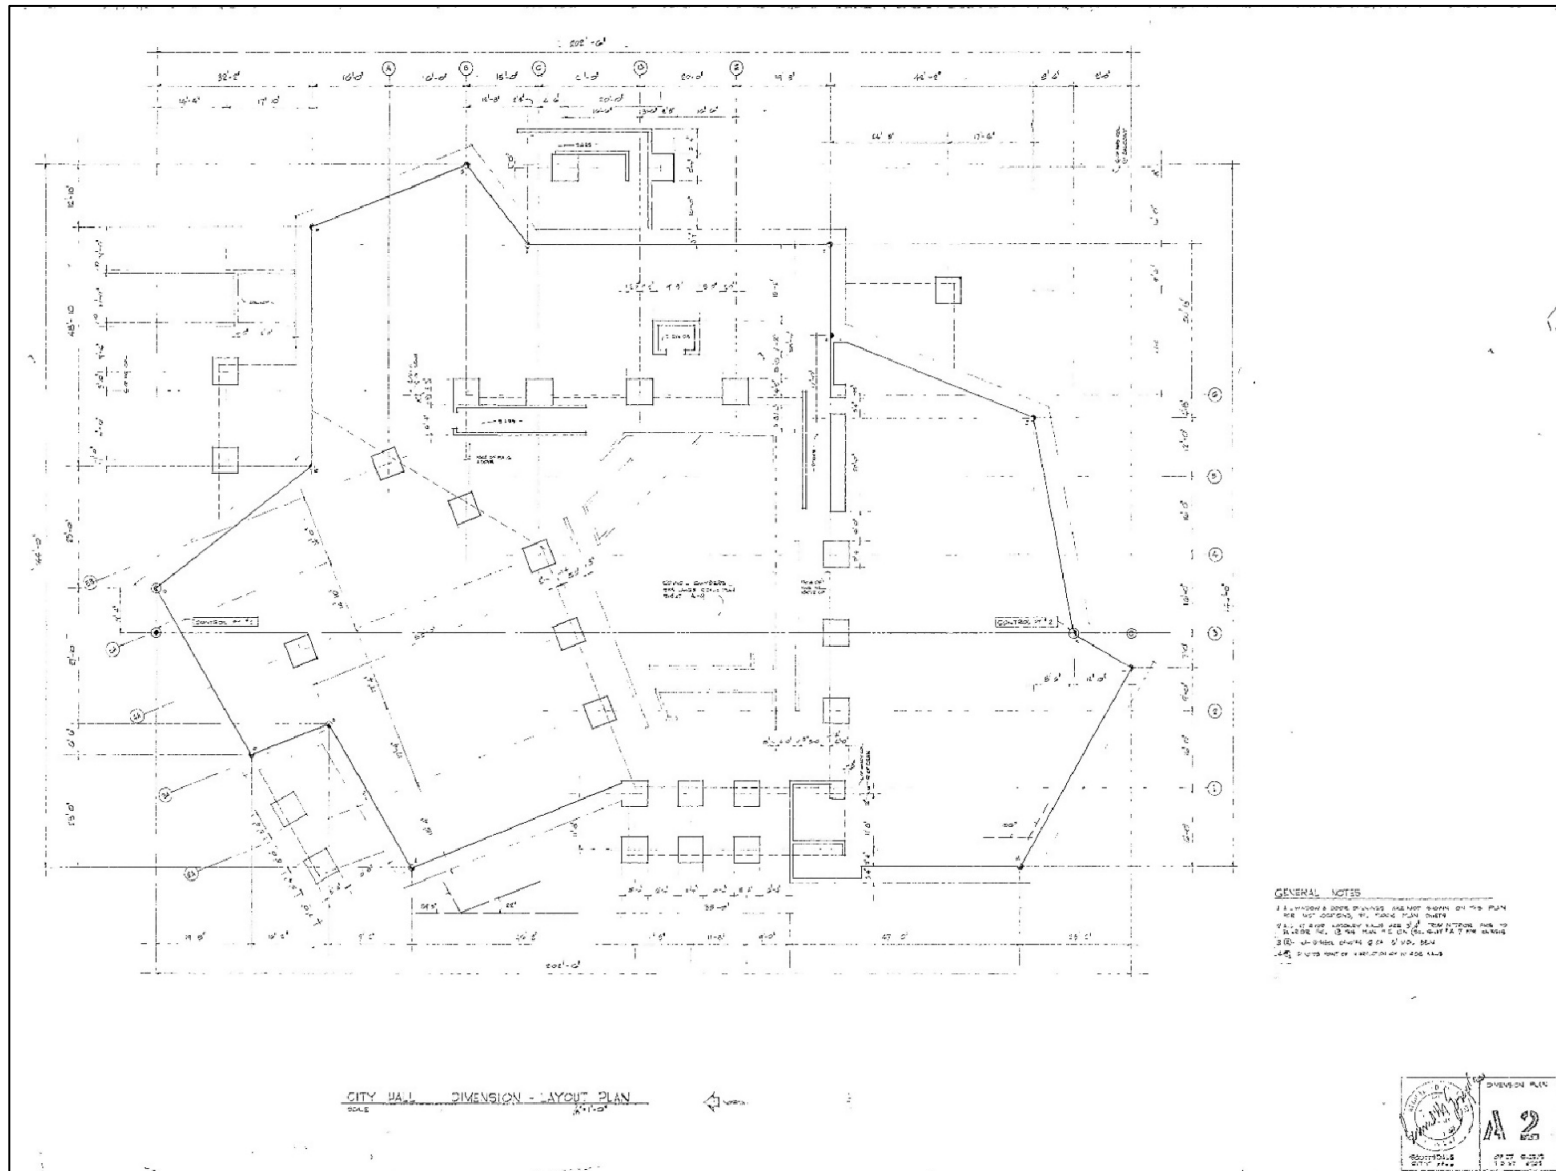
Original architectural drawings depicting the distribution of interior and exterior columns to support the roof structure (Scottsdale Public Library)
